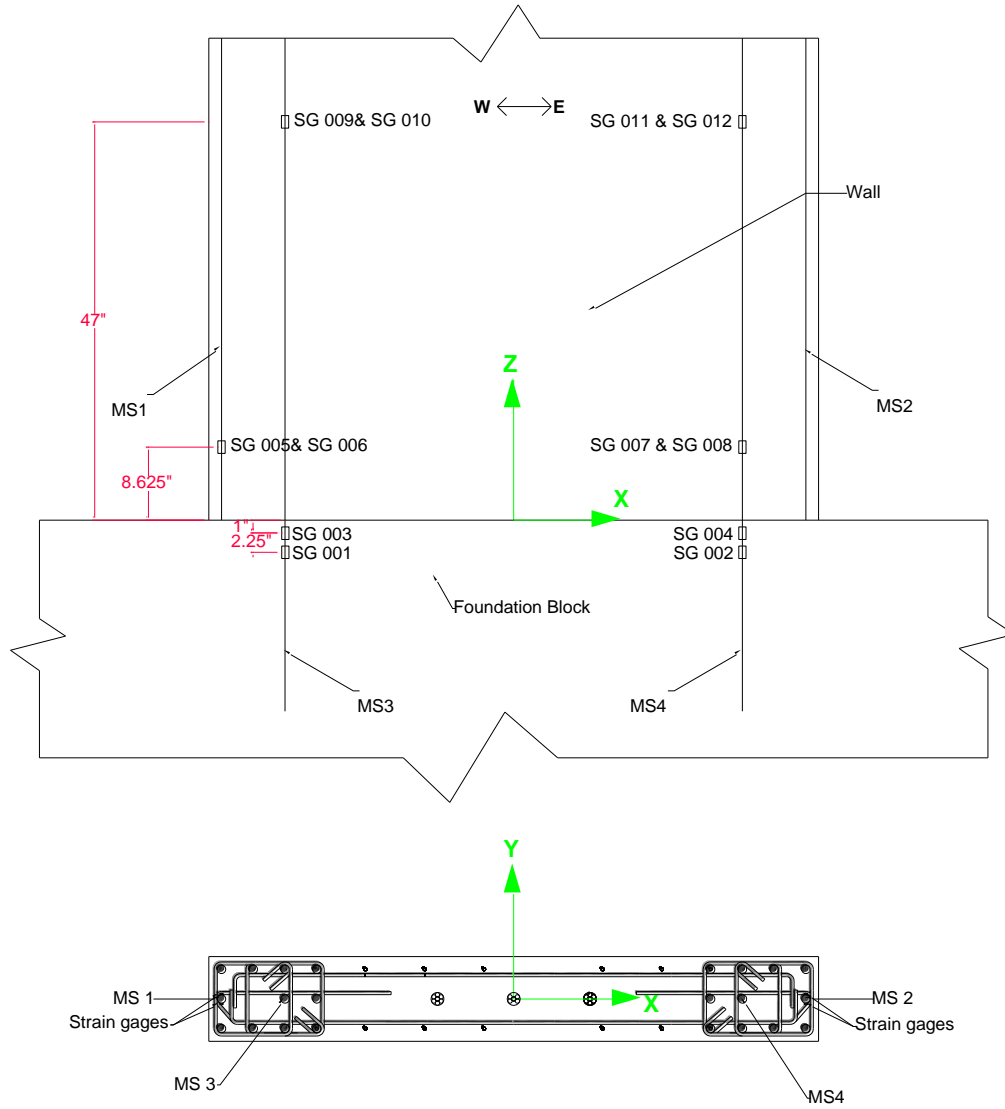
Strain gauges on longitudinal steel reinforcement on Wall 3
